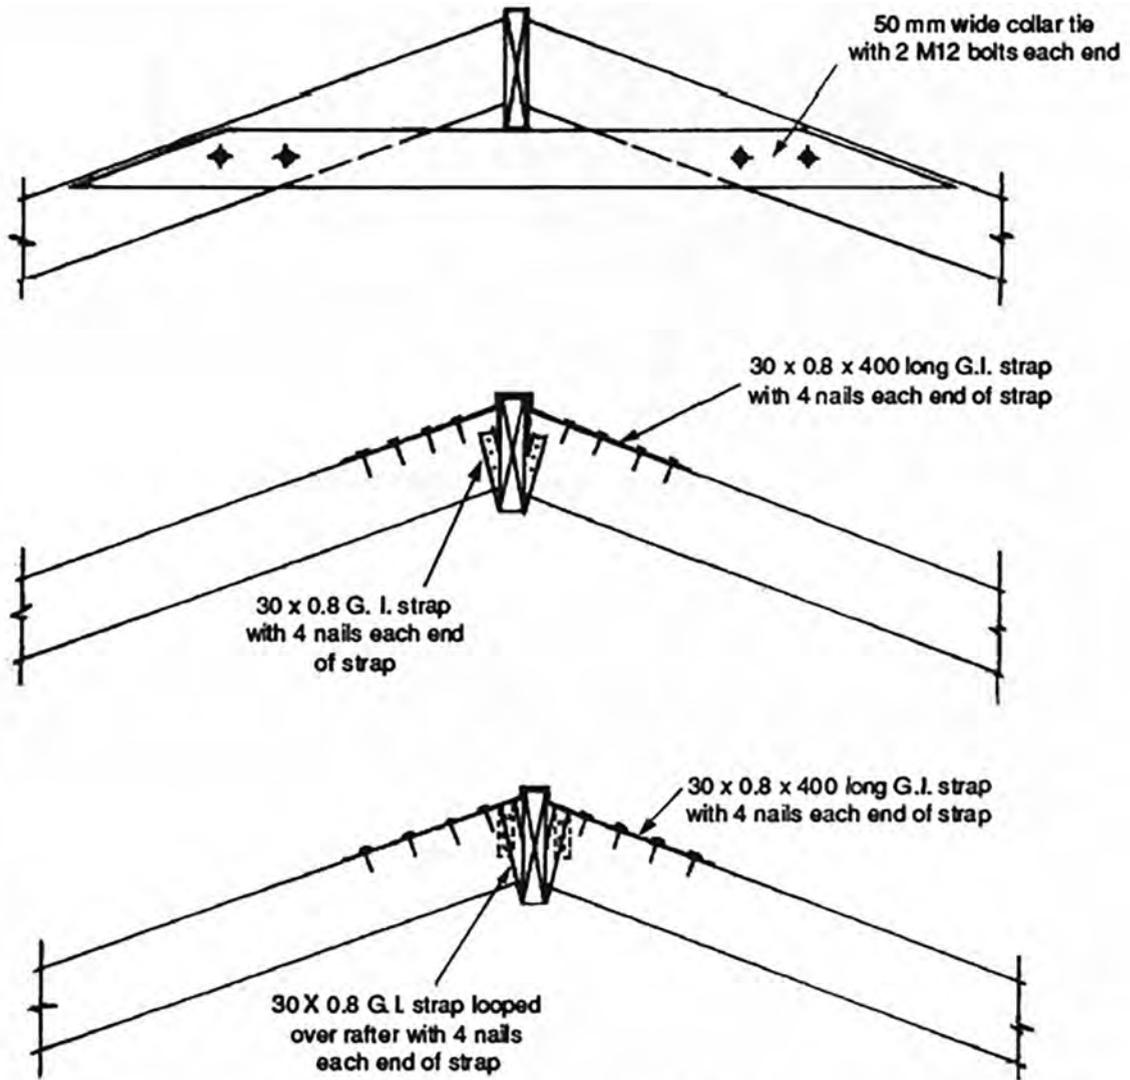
RIDGE BOARD TIE DOWN DETAIL
